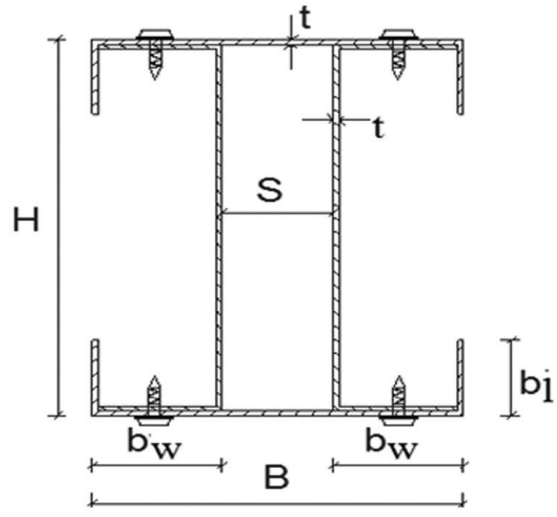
Typical built-up column details. (Anbarasu and Venkatesan, 2019)
